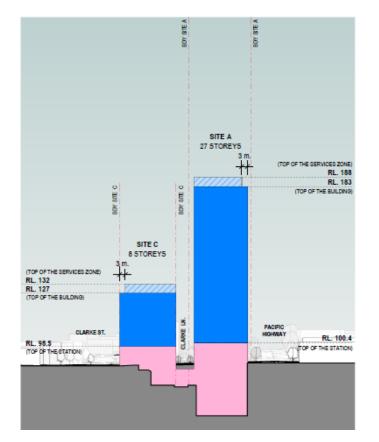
Proposed Crows Nest OSD building envelopes – cross section through the site (east-west)
